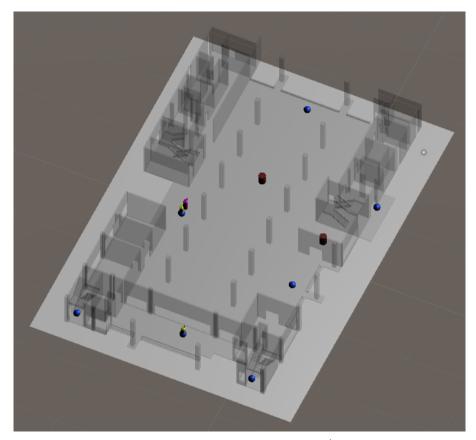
Fire extinguisher installation plan for 1st floor of scenario 1D
